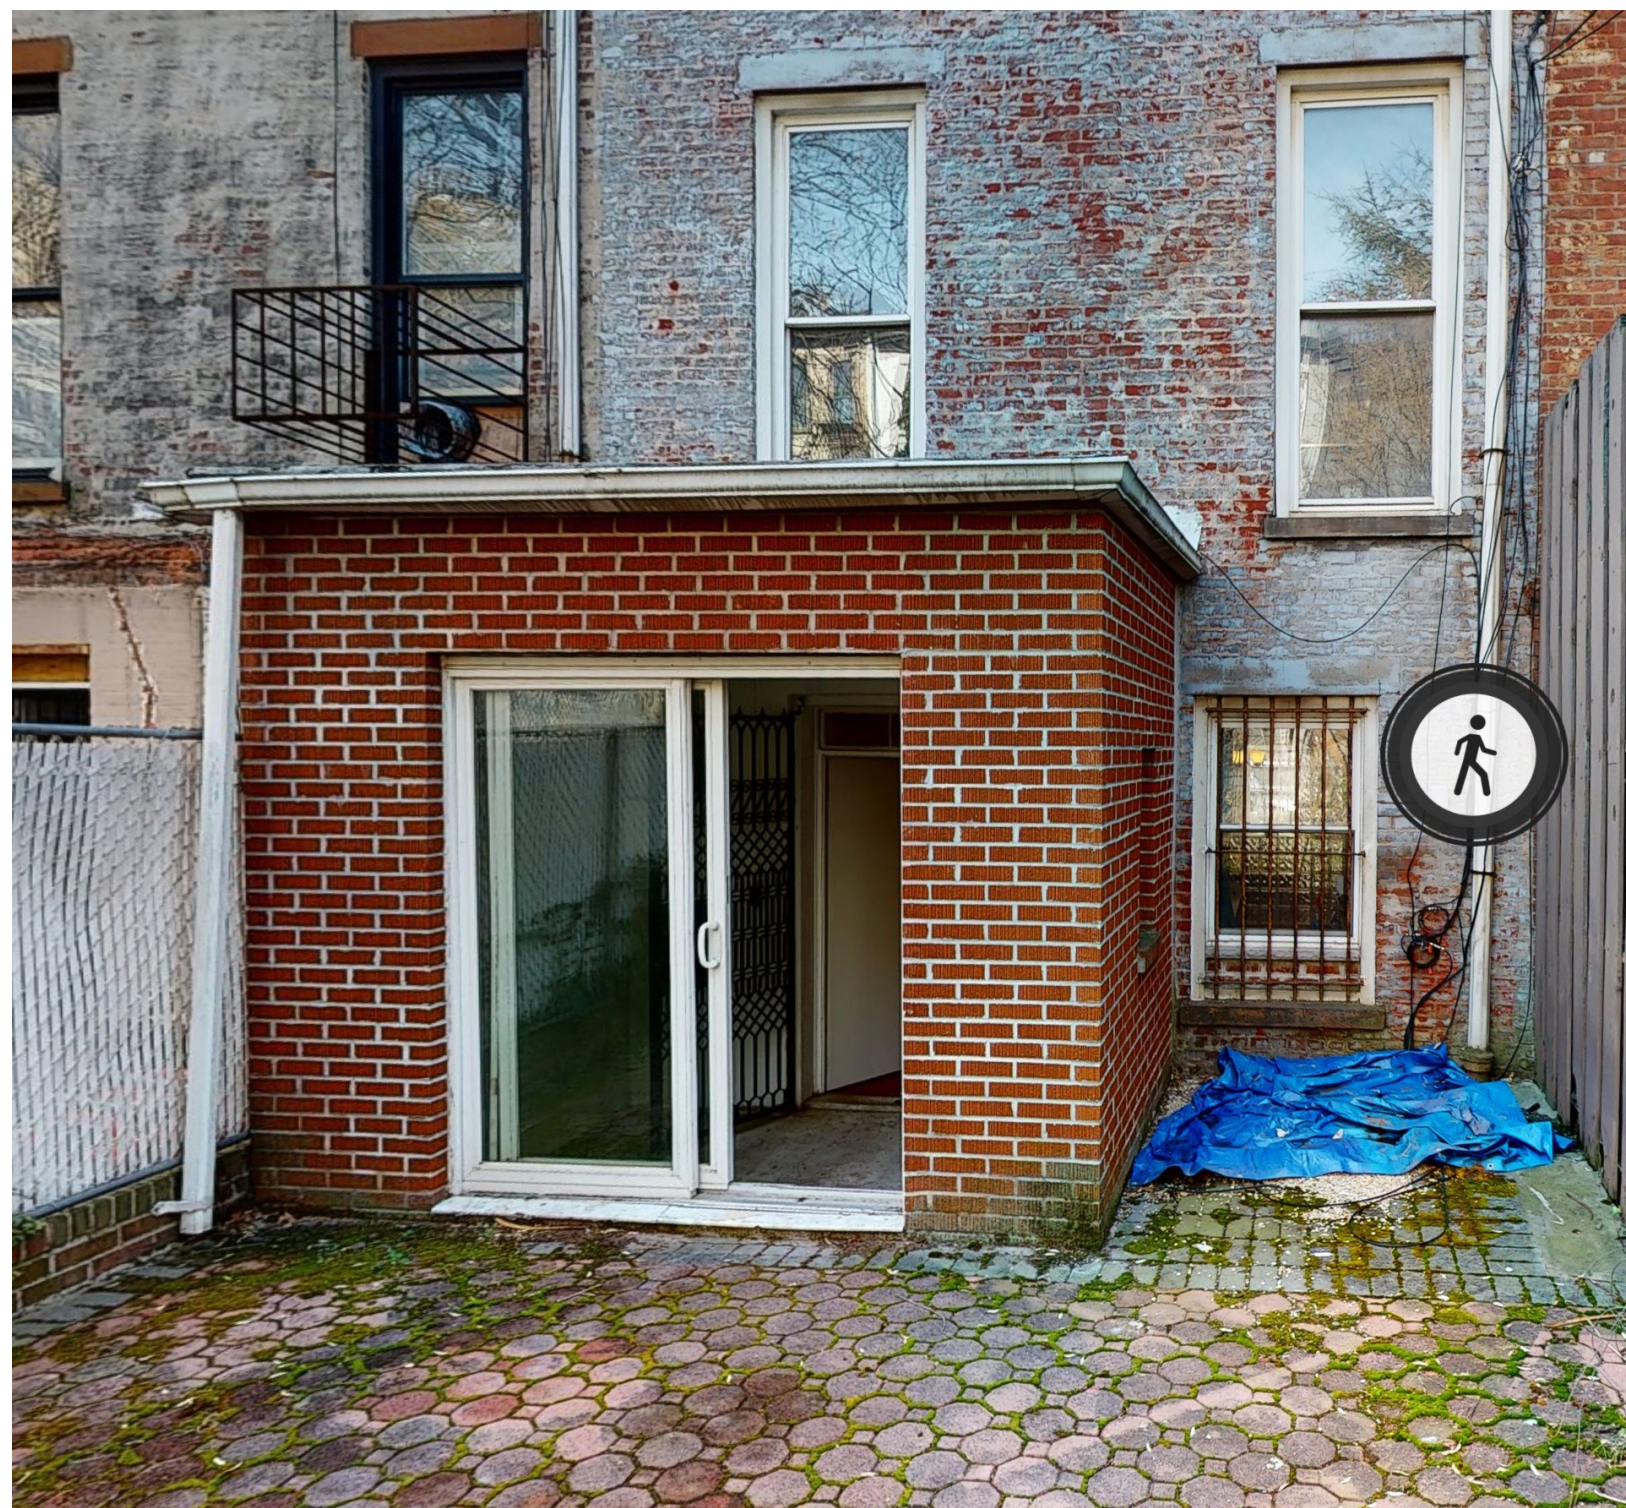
PHOTO OF EXISTING EXTENSION TO BE REMOVED
